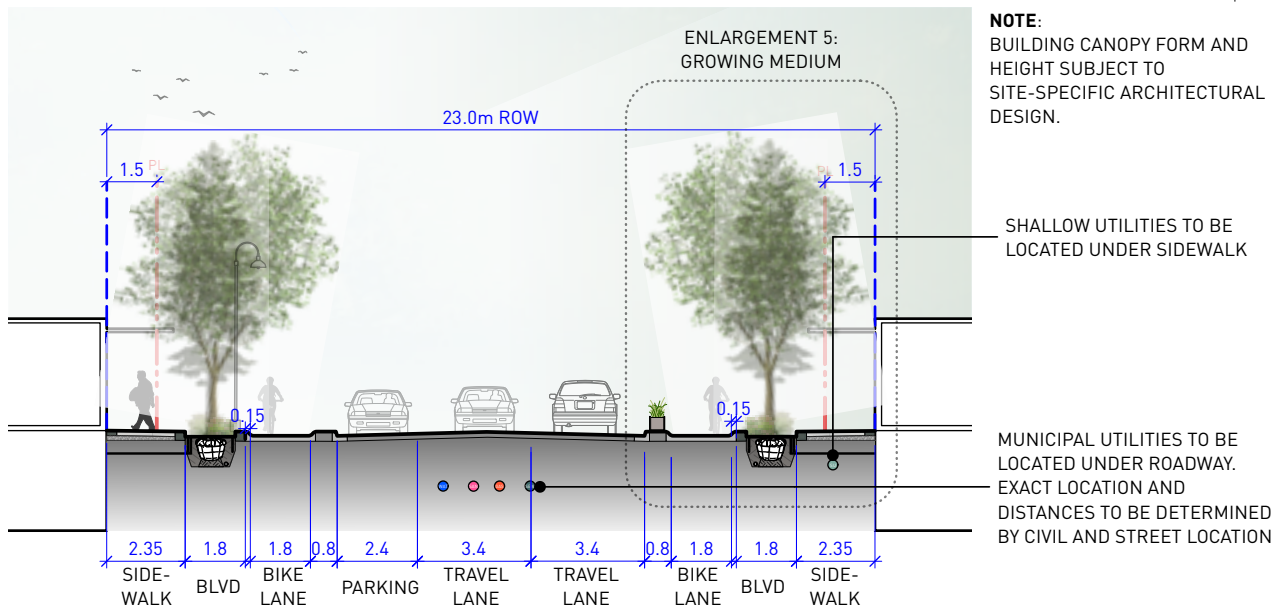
SECTION 1 - TYPICAL STREETSCAPE
